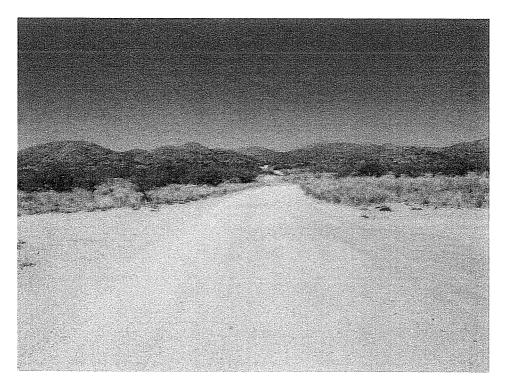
VIEW WEST ALONG EL MIRADOR ROAD
